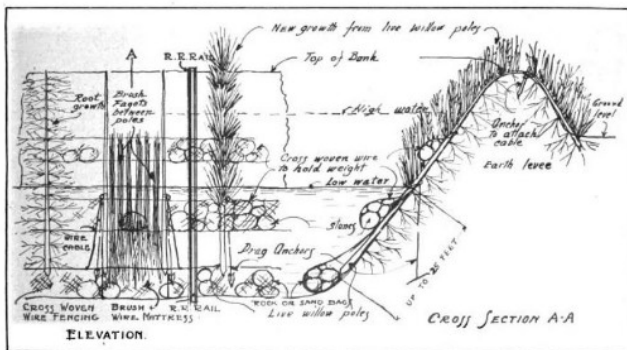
SKETCH SHOWING SYSTEM OF RIVER CONTROL BY WILLOW POLE PLANTING
